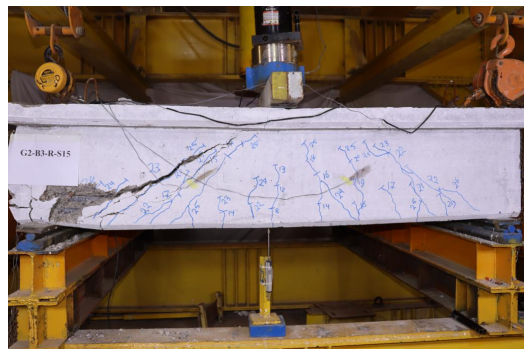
Failure crack pattern of specimen G2-B3-R-S15.
